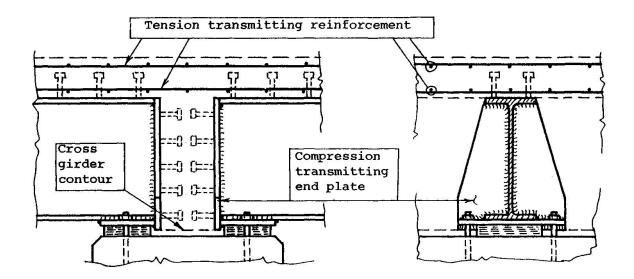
End-plate type connection for continuity under Live Load. (Cross girder reinforcement is not shown for clarity.)
